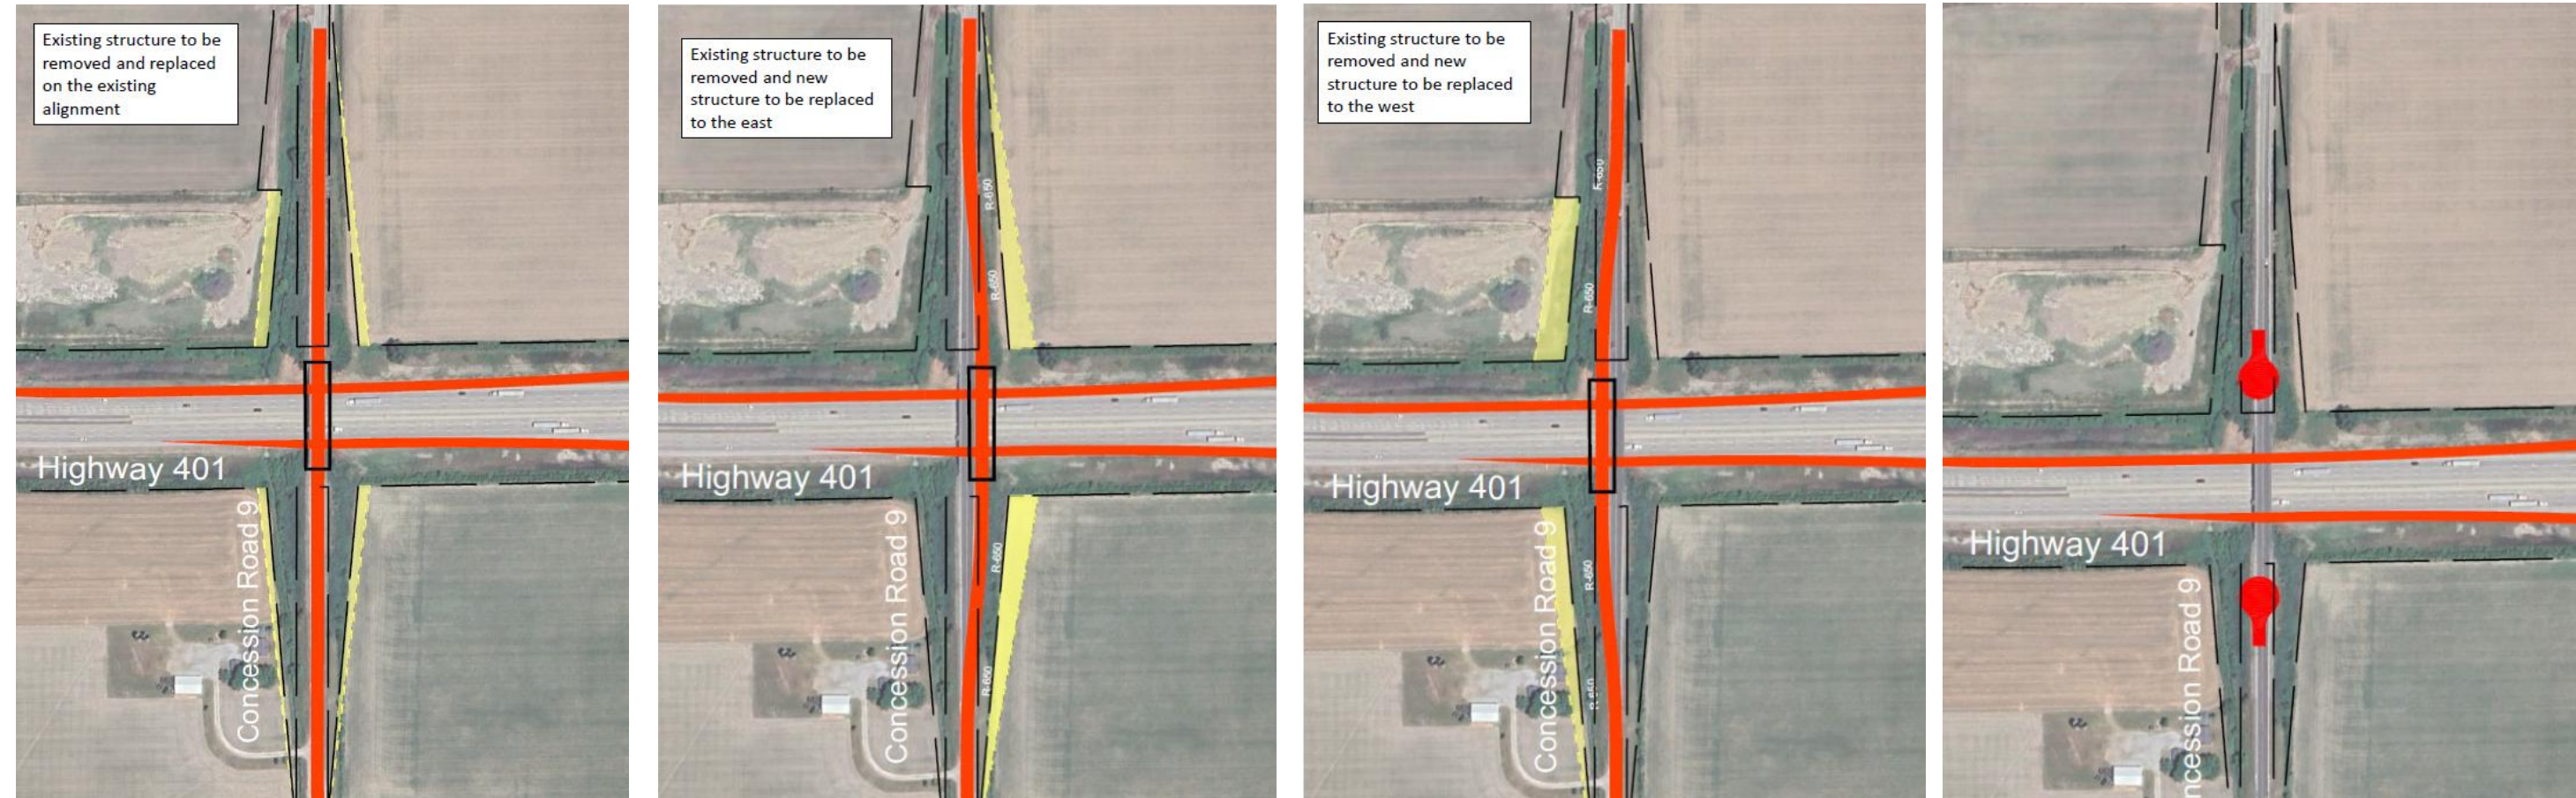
Alternative 1 – Replace on Existing Alignment. Bridge closed with detour Figure 9: Alternative 2 – East Bridge. Open with two lanes Figure 10: Alternative 3 – West Bridge. Opens with two lanes Figure 11: Alternative 4 – Full Closure of Concession Road 9
